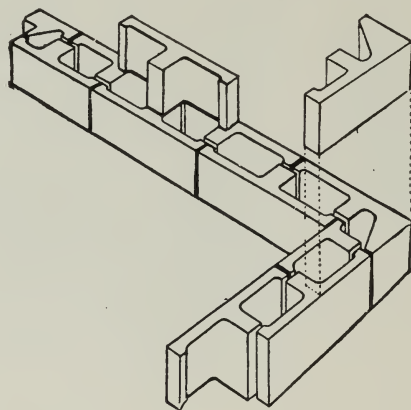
Two-piece Concrete Blocks. Corner Construction.
